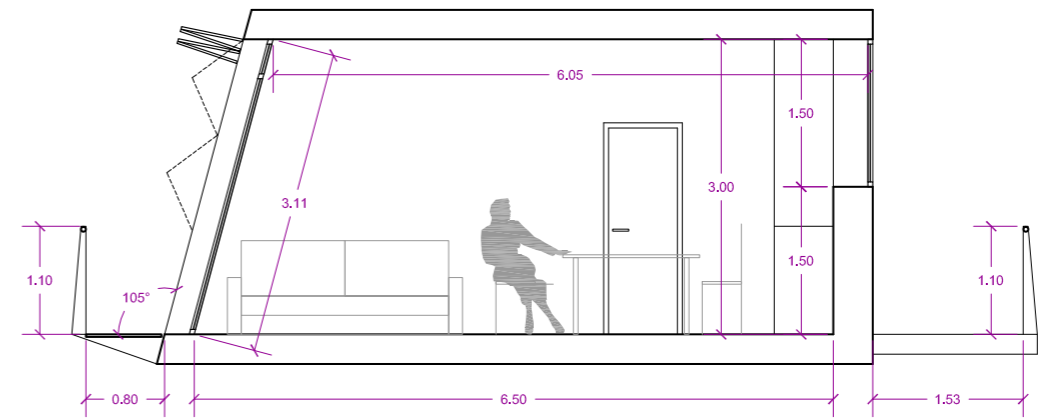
3 bedroom typology - longitudinal section
